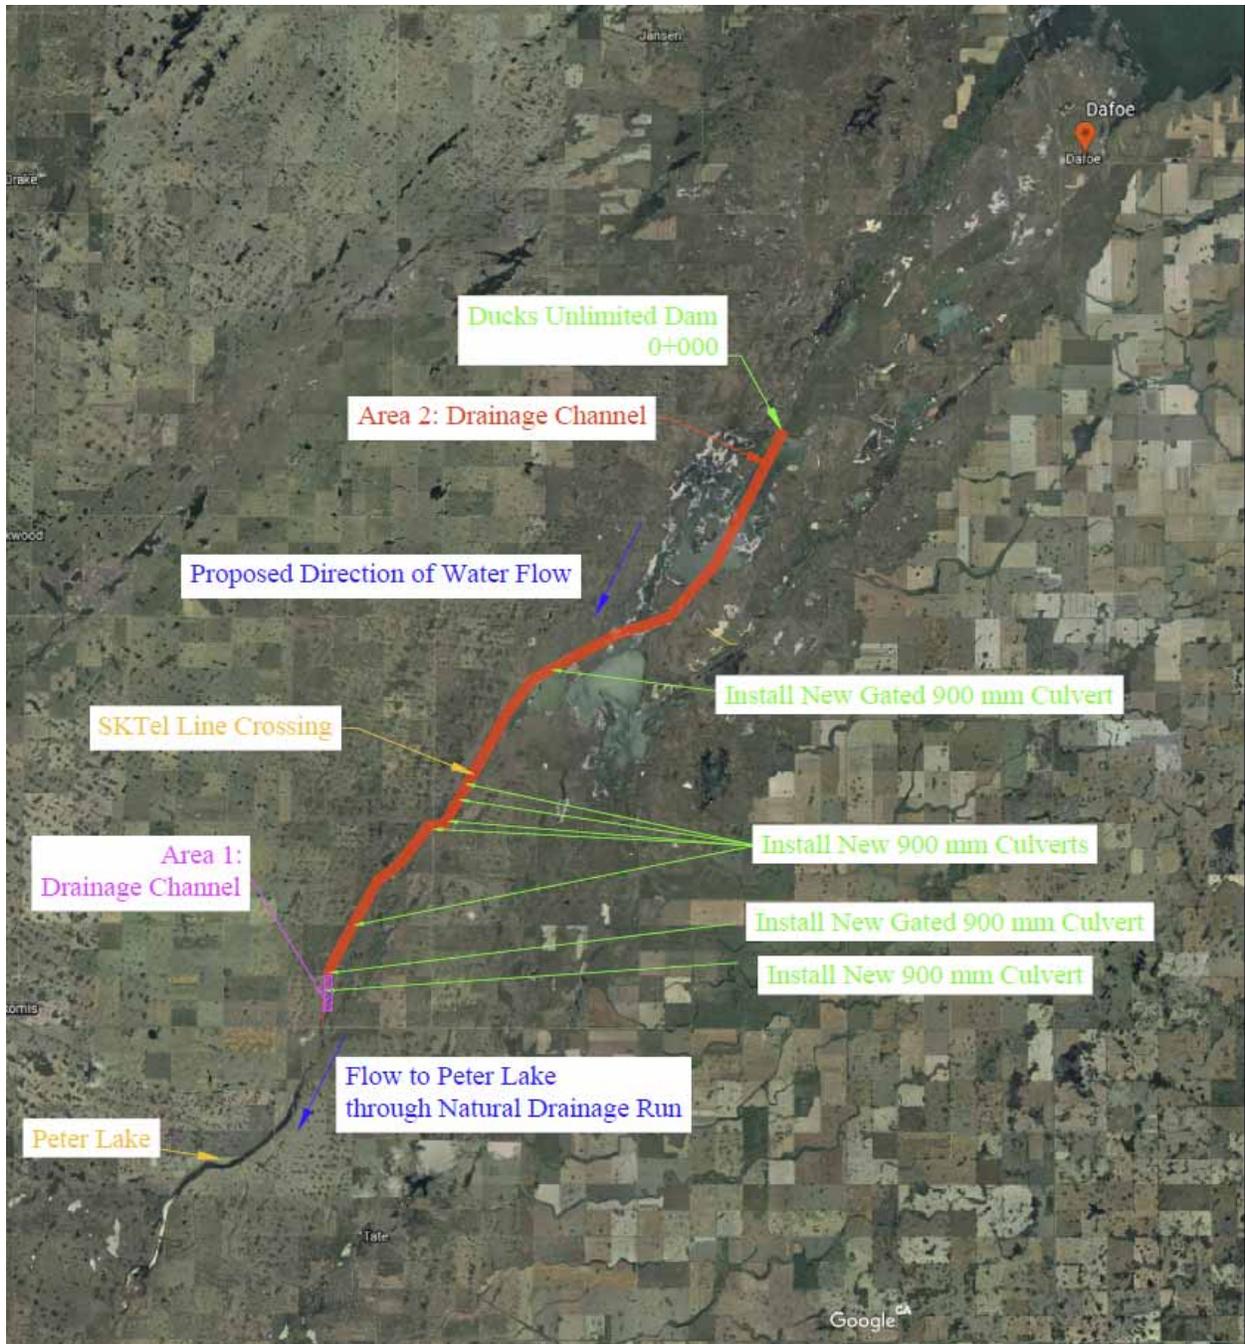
Plan View of Area 1 and Area 2 Channel Construction
